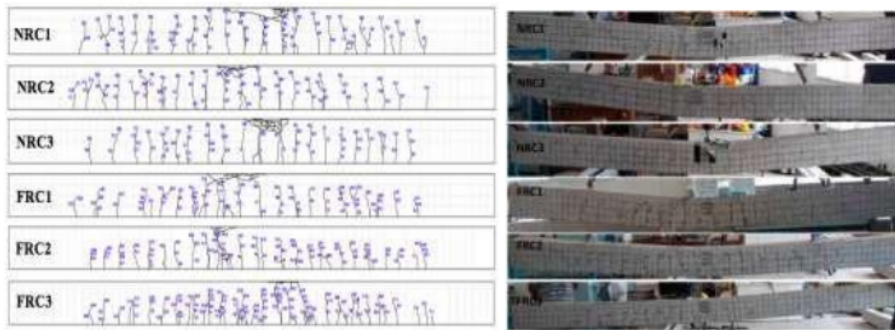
Crack pattern of test specimens (NRC) and (FRC)
